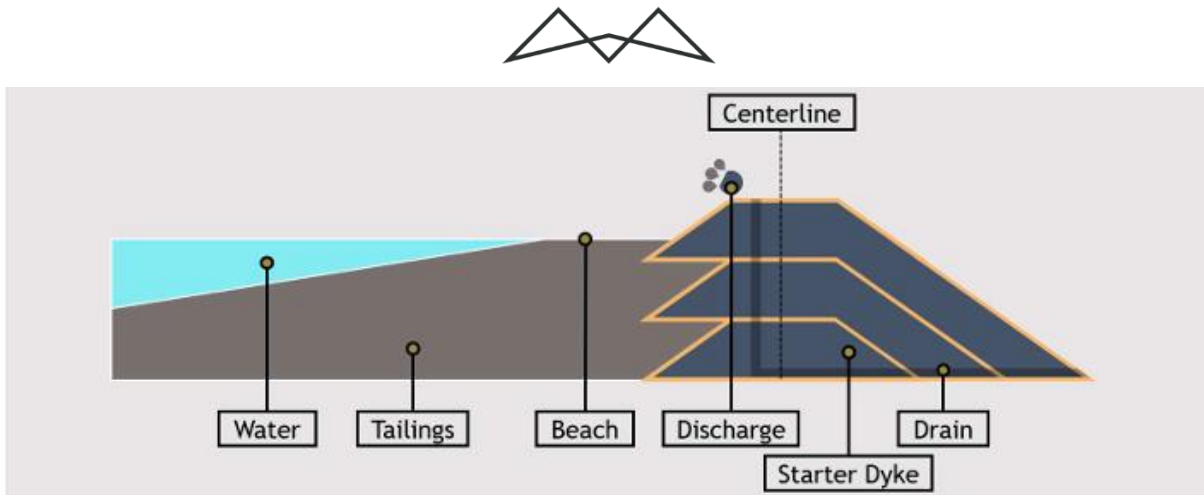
Centreline Tailing Storage Facility design (Yanama Gold, 2023)
